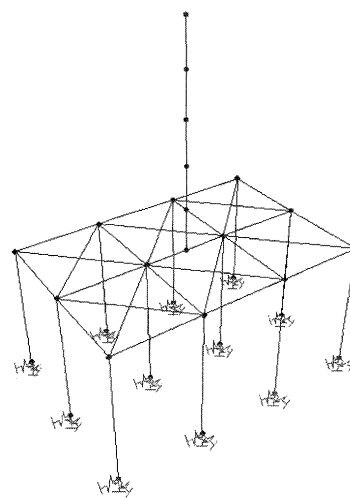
Structural model of pier foundation by using exact equivalent cantilevers
